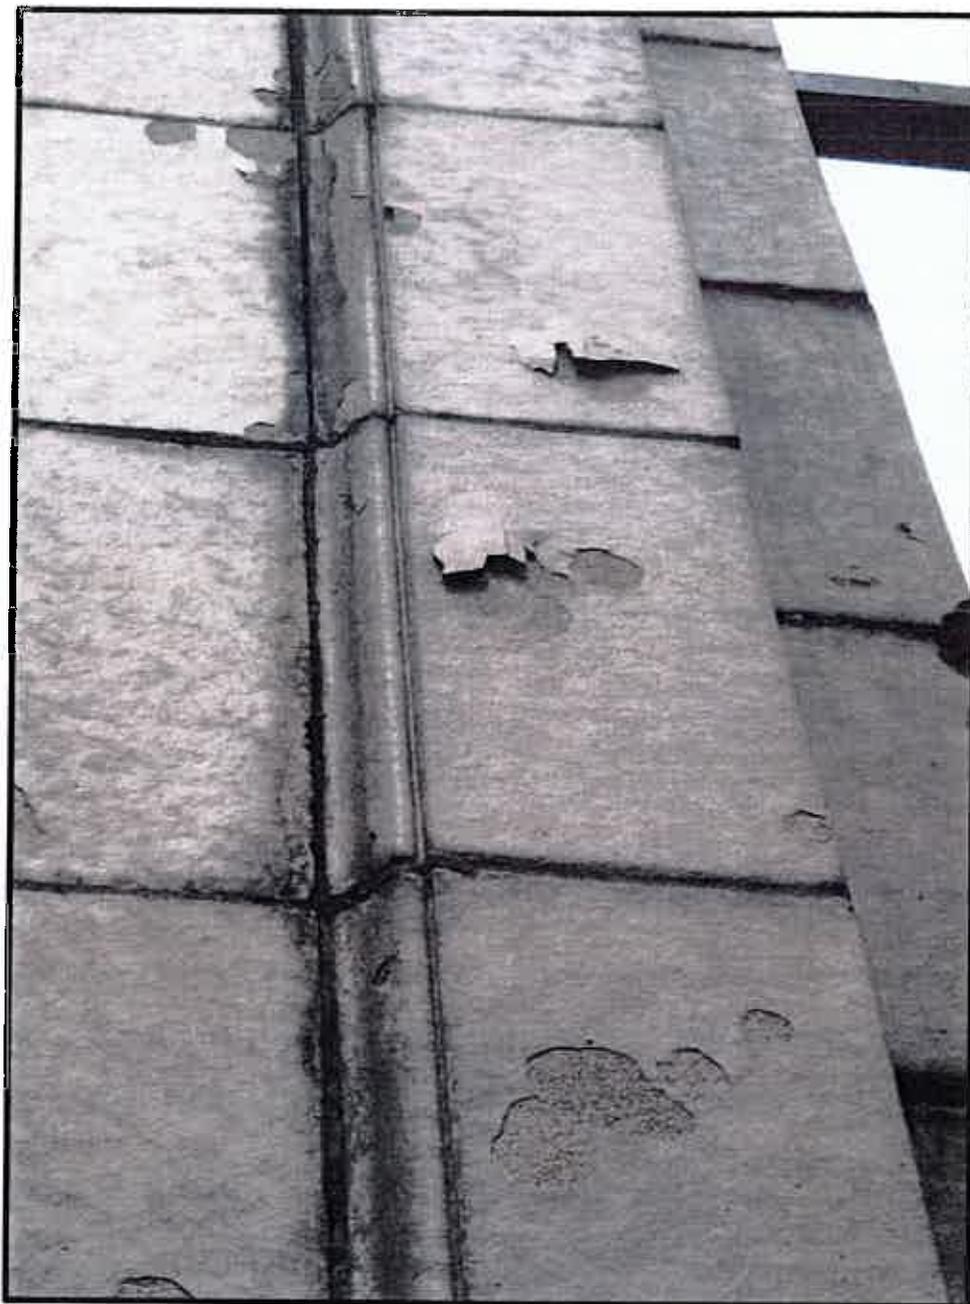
Extensive spalling and flaking on the right bay pilaster.
